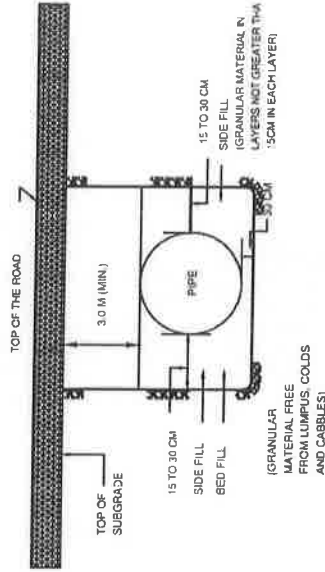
INSTALLATION OF PIPE FOR ALONG THE ROAD
